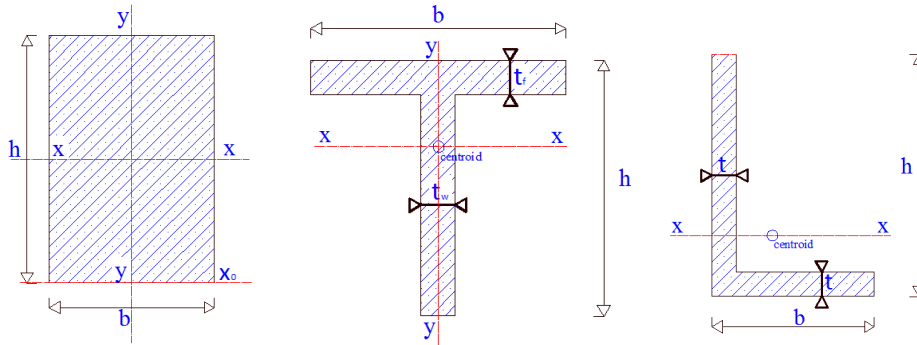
Rectangular area, Tee section, Angle section, respectively.
